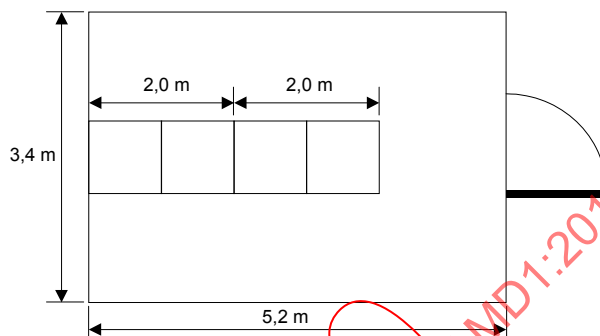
Minimum room dimensions to support distributors containing between 501 and 1 000 outlets
